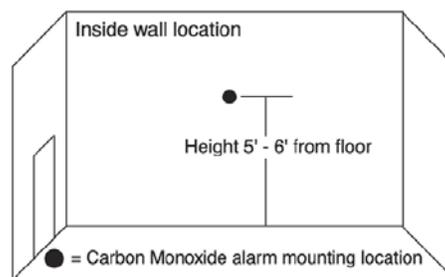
Recommended CO alarm wall mounting location is 5 to 6 feet from floor
